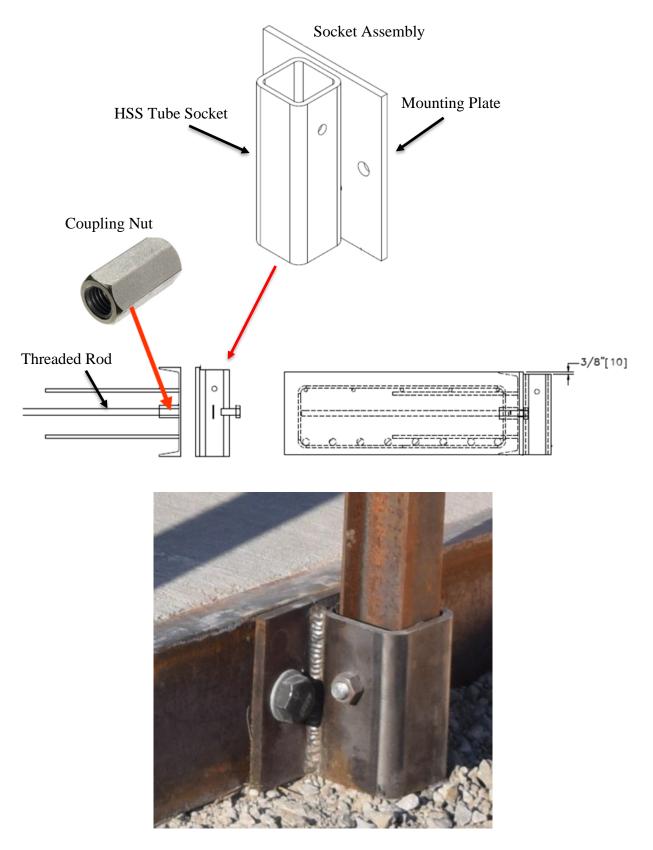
Coupling Nut and Threaded Rod Attachment of Socket Assembly to Deck
